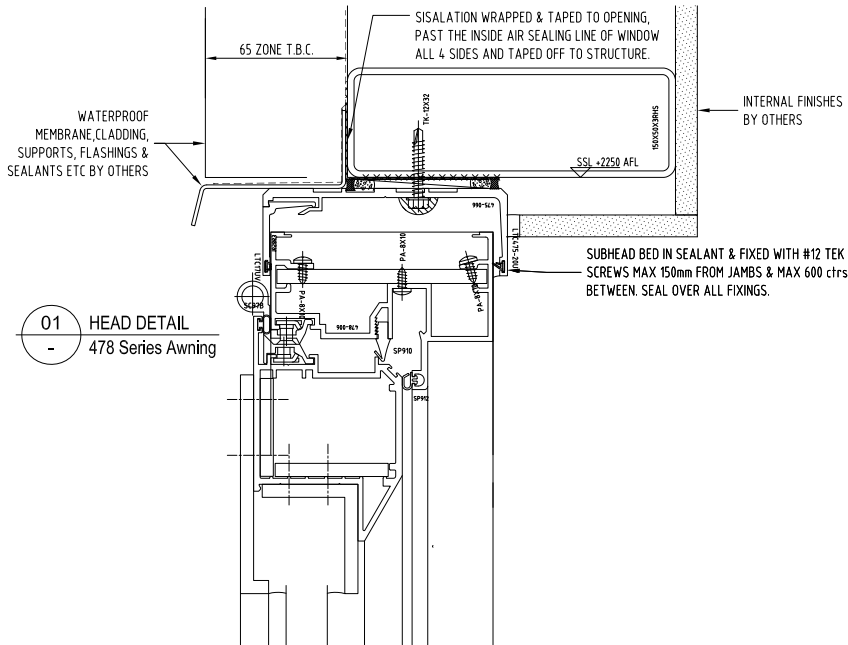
Australian Institute of Tropical Health and Medicine, fixed glazing details at structural steel sections.
